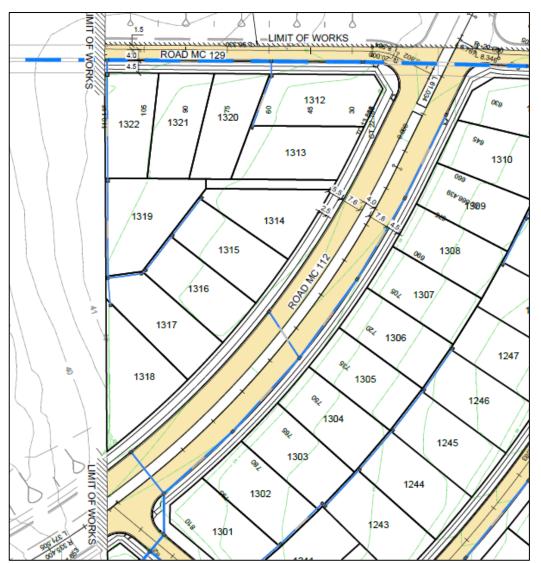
Extract of Approved General Arrangement Sheet 103 under DA/2021/1460 (Source: BRS, 2023)
